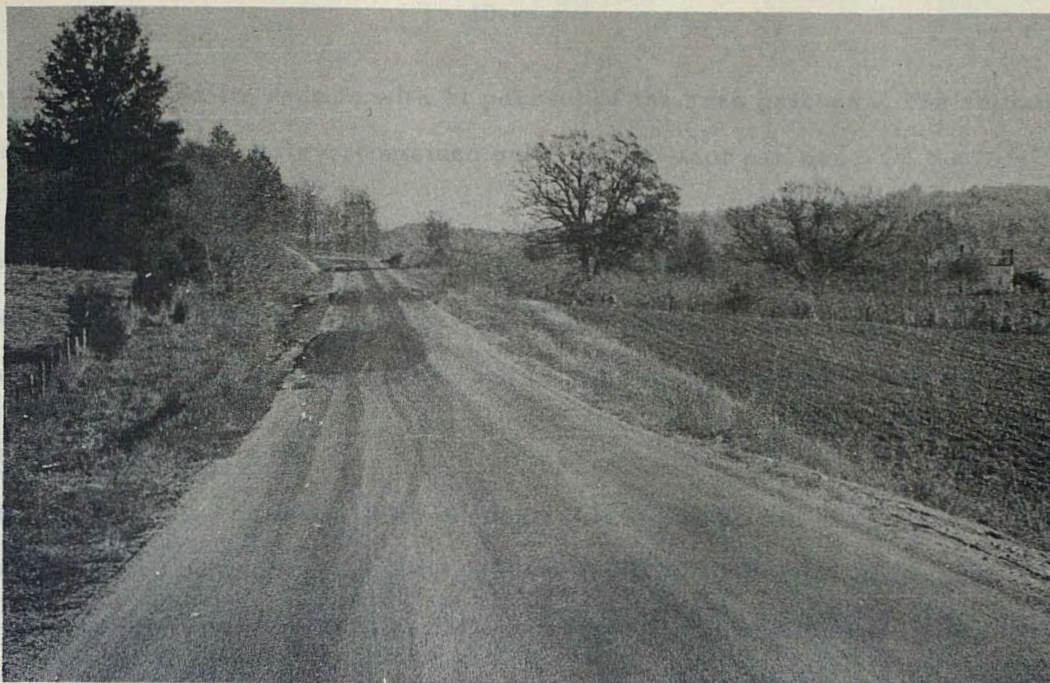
Lewis Co., Showing Extensive Failure in Small Sidehill Cut
